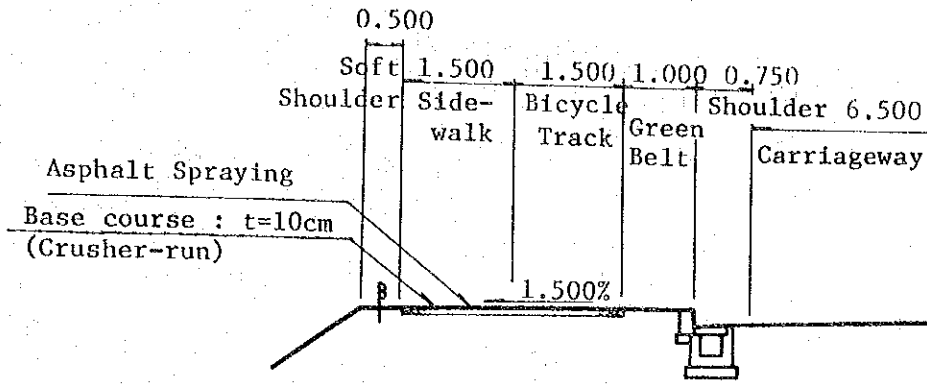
Pavement Structure for Sidewalk/Bicycle track in Embanked Section
